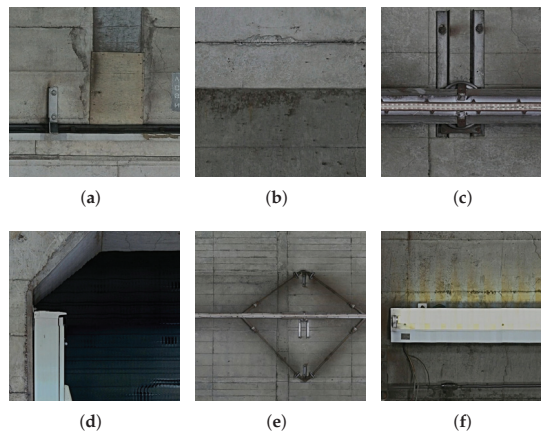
Example of background images. (a–f) show cable, concrete joint, connection component of overhead conductor rail, passage tunnels, overhead conductor rail, and lighter, respectively. (Resolution: 1 mm/pixel, Image size: 256×256 pixels).
